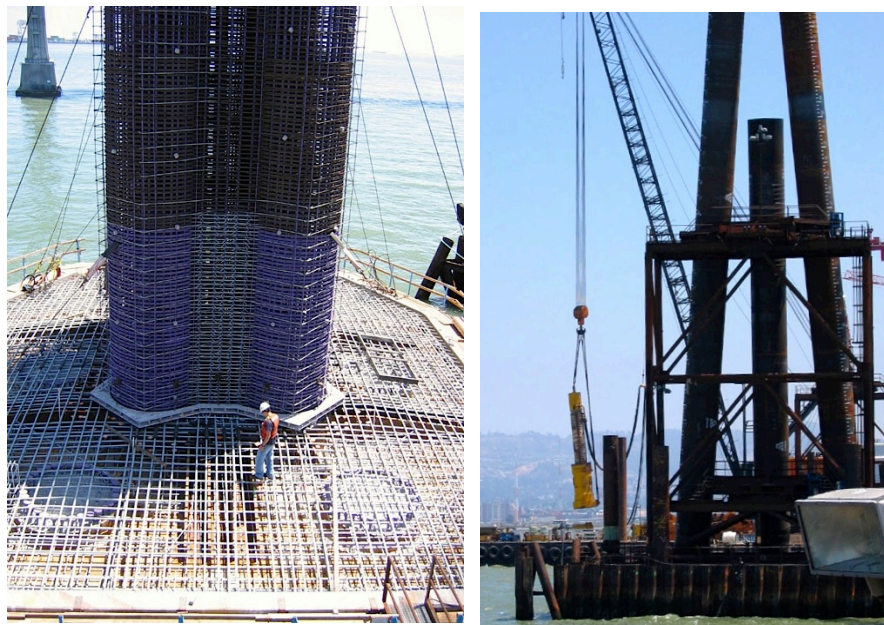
SAS span and skyway foundations, respectively [Ref.: http://www.pbase.com/donphotos/new_bay_bridge]
